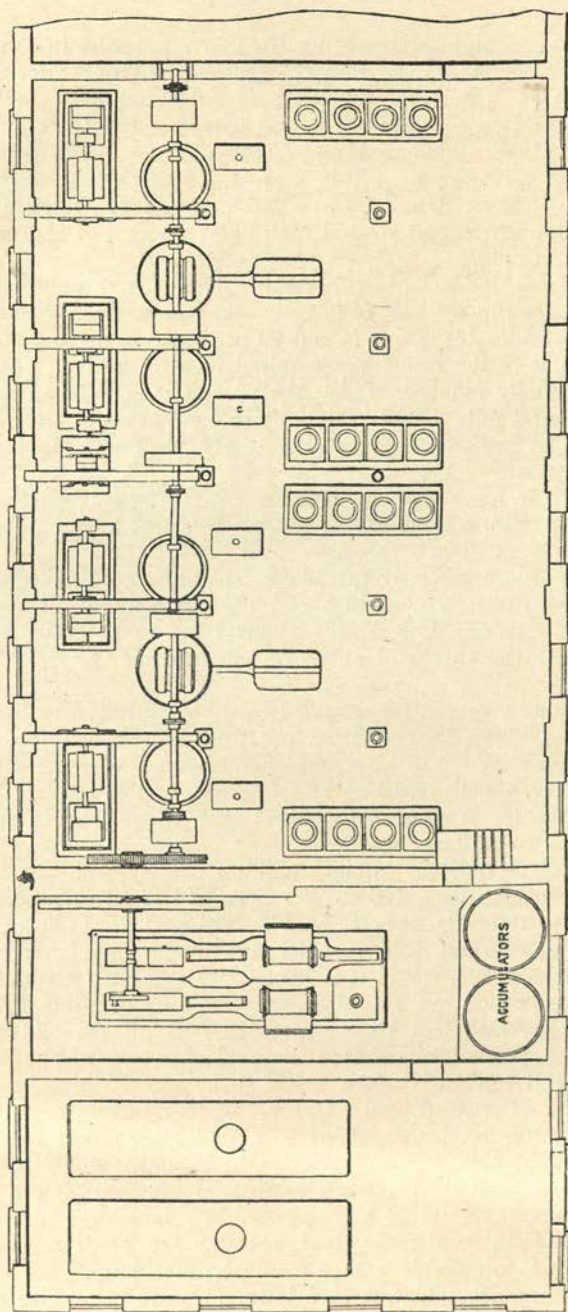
Oil Mill Plant; Ground Plan of 16-Press Installation.
